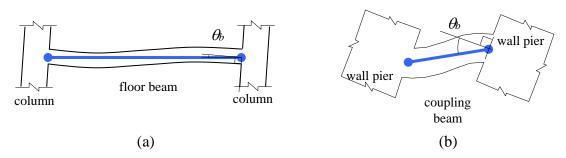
Chord rotation of (a) a floor beam and (b) a coupling beam
